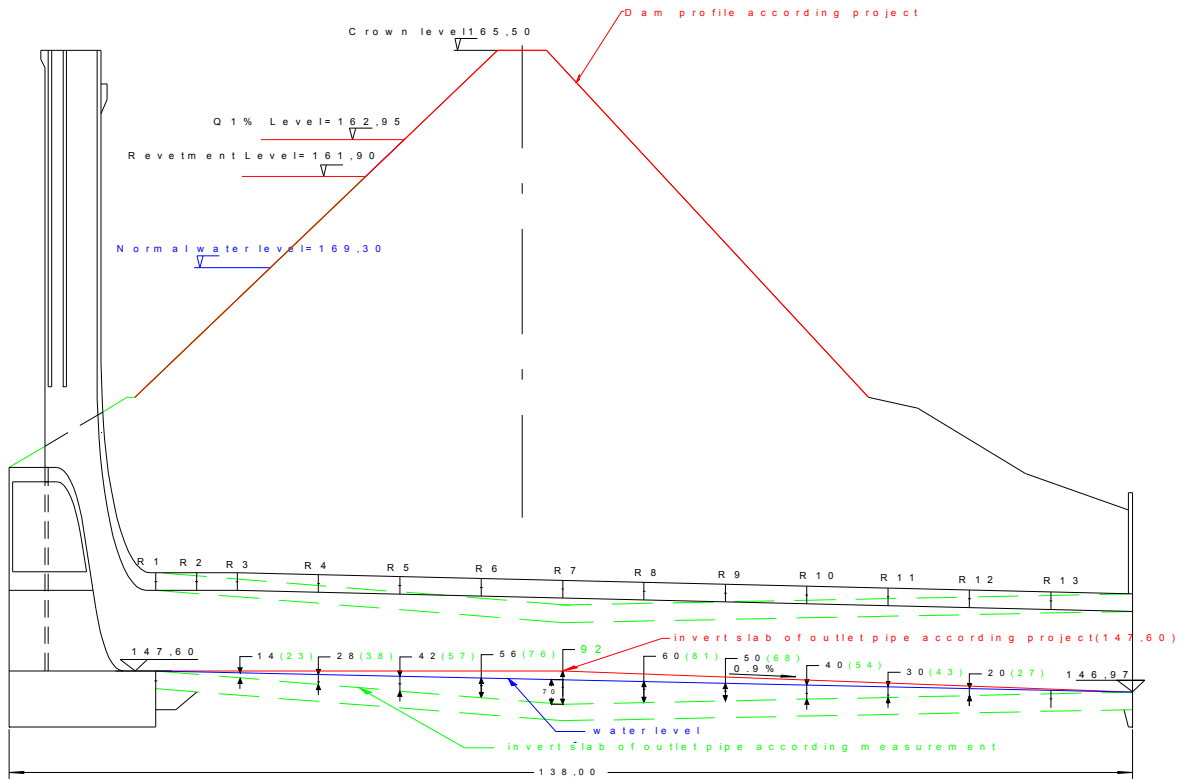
Longitudinal section through outlet pipe (different scale horizontal and vertical)
